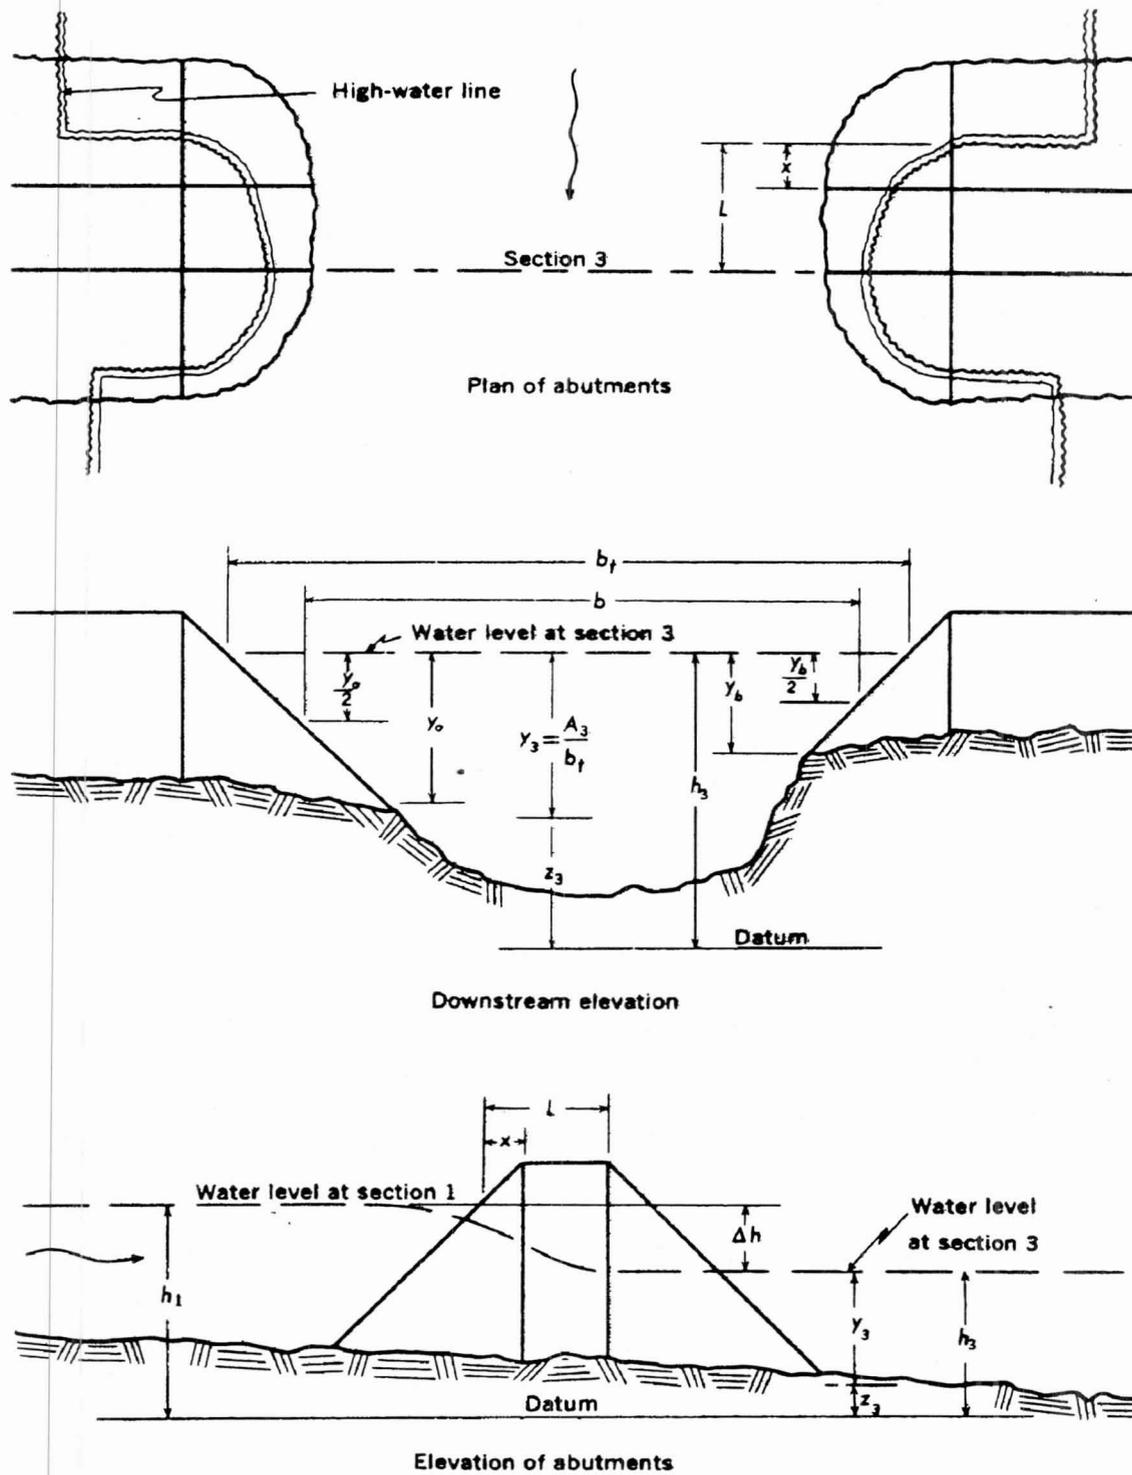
Definition sketch of type 3 opening, sloping embankments and sloping abutments (spill through) (after Matthai).
